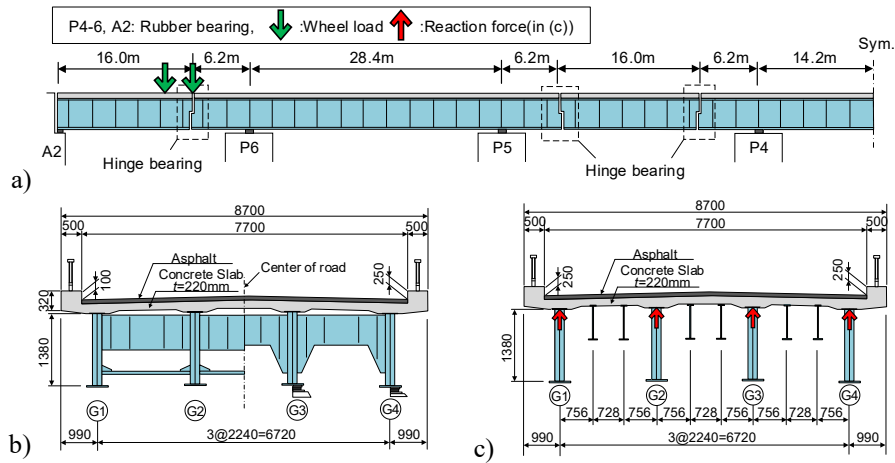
General drawing of the actual bridge: (a) side view; (b) sectional view (girder end); and (c) sectional view (the central part)
